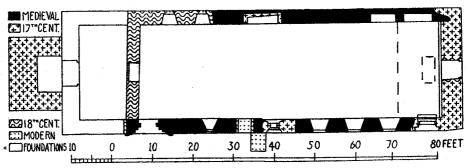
WHITHORN: POST-REFORMATION CHURCH.
